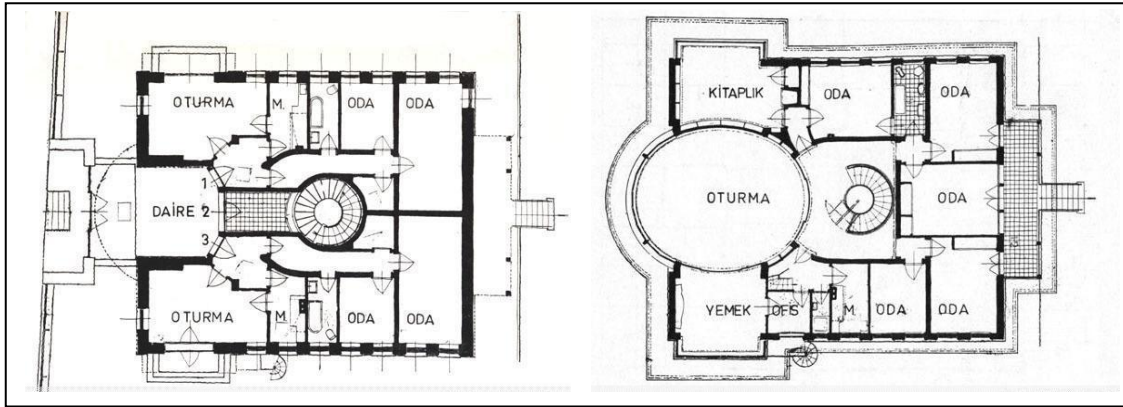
Floor plans of Ahmet Ağaoğlu house [73]
